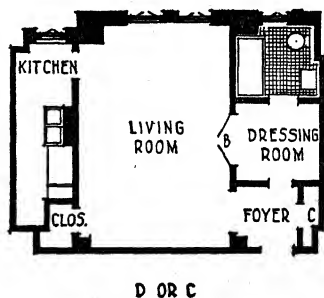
PLANS, LONDON TERRACE APARTMENT, NEW YORK CITY
